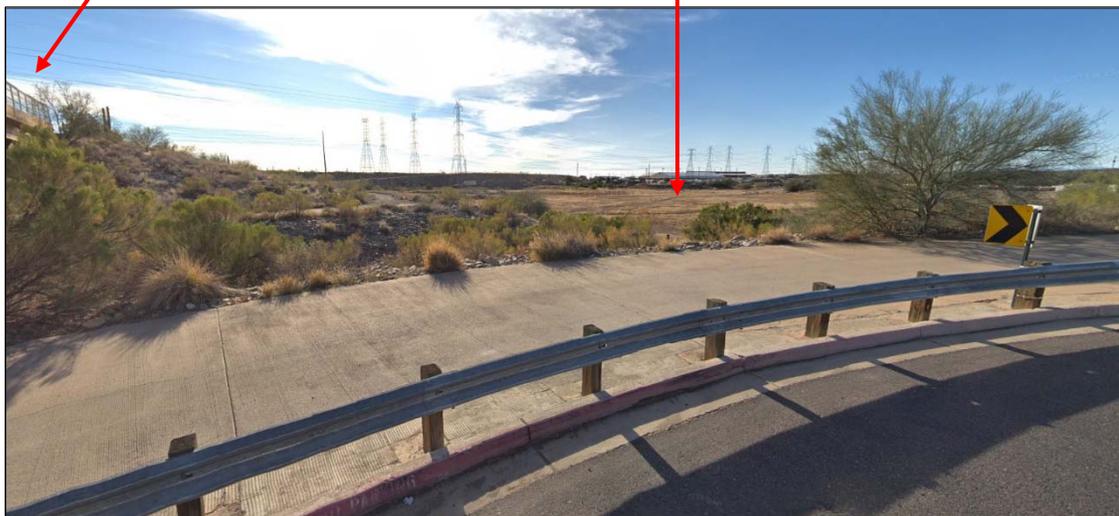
Looking south toward CAP Canal, with Thompson Peak Parkway up above on left.
